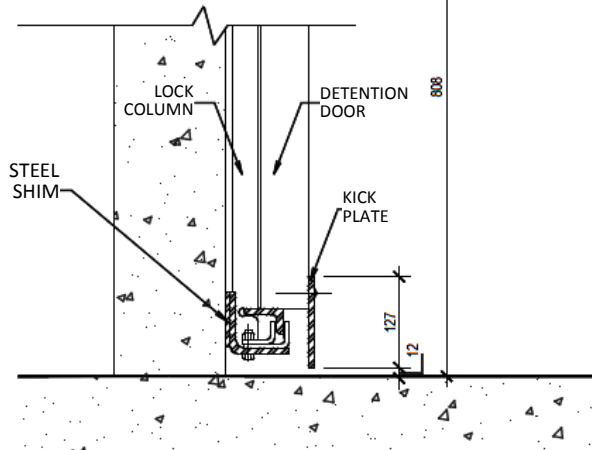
CORRIDOR ELEVATION OF TYPICAL DD2 SLIDING CELL DOOR
